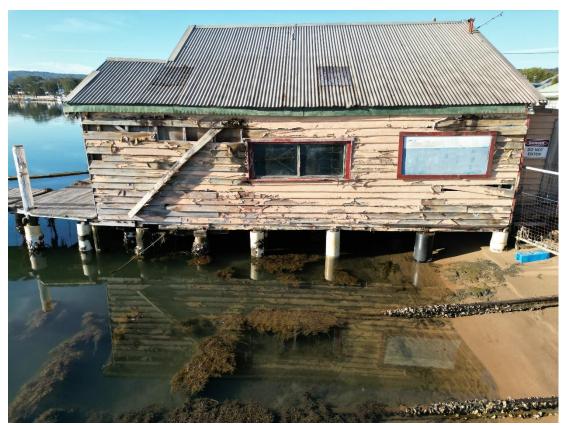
Detail of the northern elevation of the boat shed showing deterioration of timber cladding and slipway rails below HWM.
